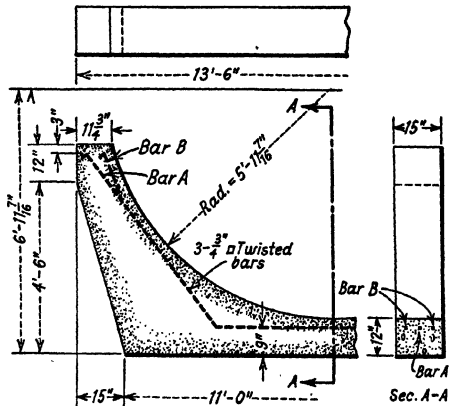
Reinforced Concrete Saddle for Wood-stave Pipe. Grace Development, Utah Power and Light Co. Concrete Sills Not Shown.
